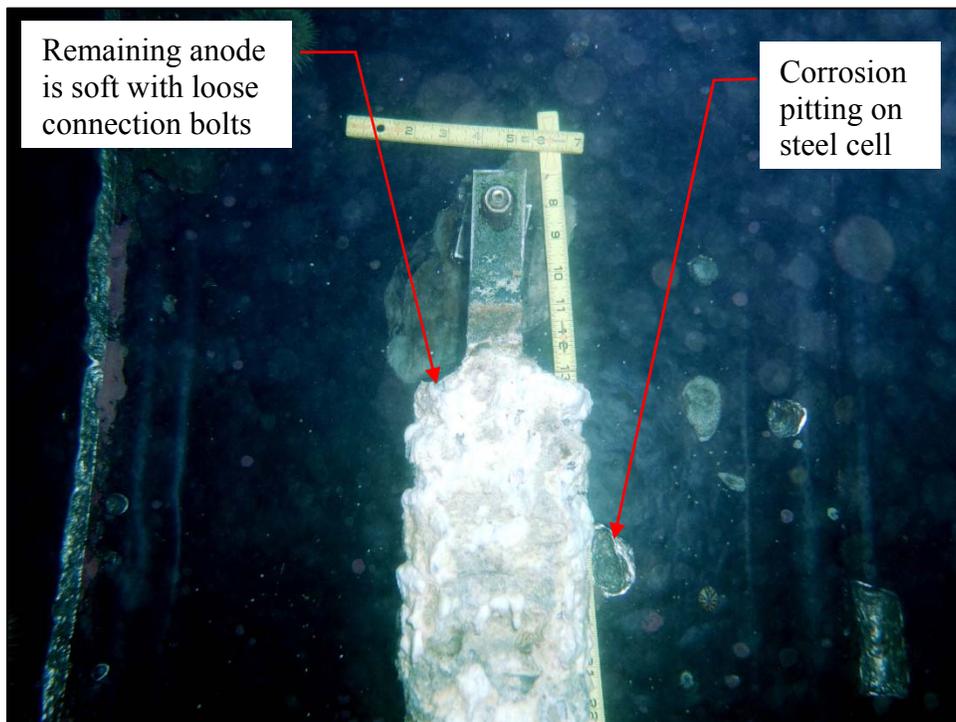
Sacrificial anode on north face sheet pile, cell 2, below water.
